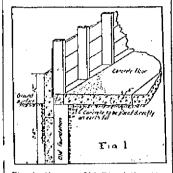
How an Old Foundation May Be Ratproofed and a Concrete Floor Installed.
